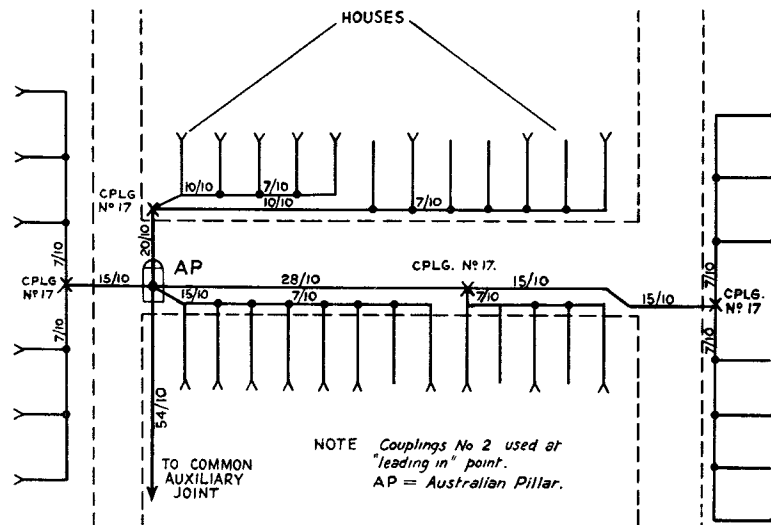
TYPICAL LAY-OUT FOR NEW HOUSING ESTATE.
